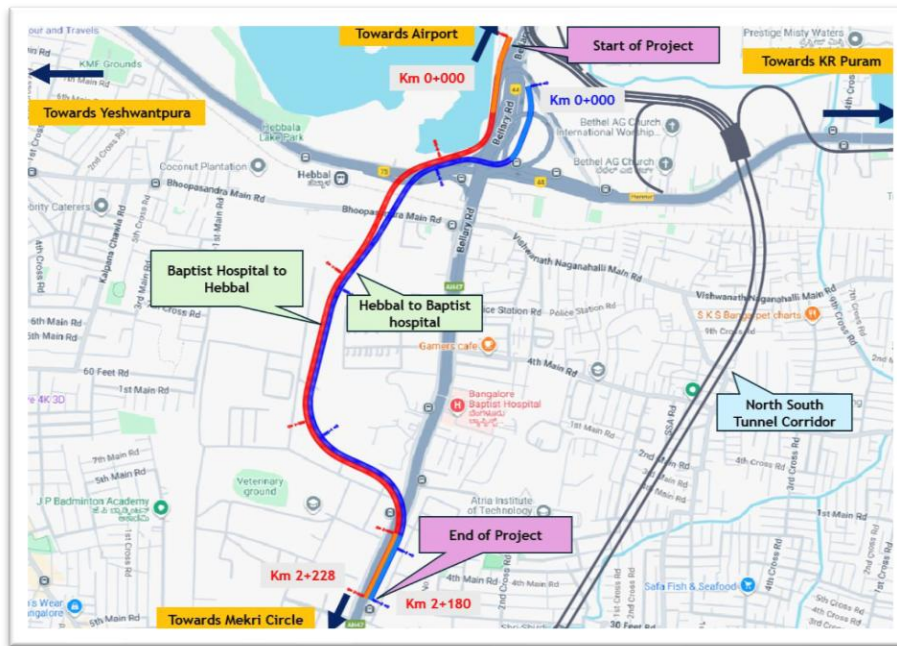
Short Tunnel from Hebbal to Veterinary Ground
